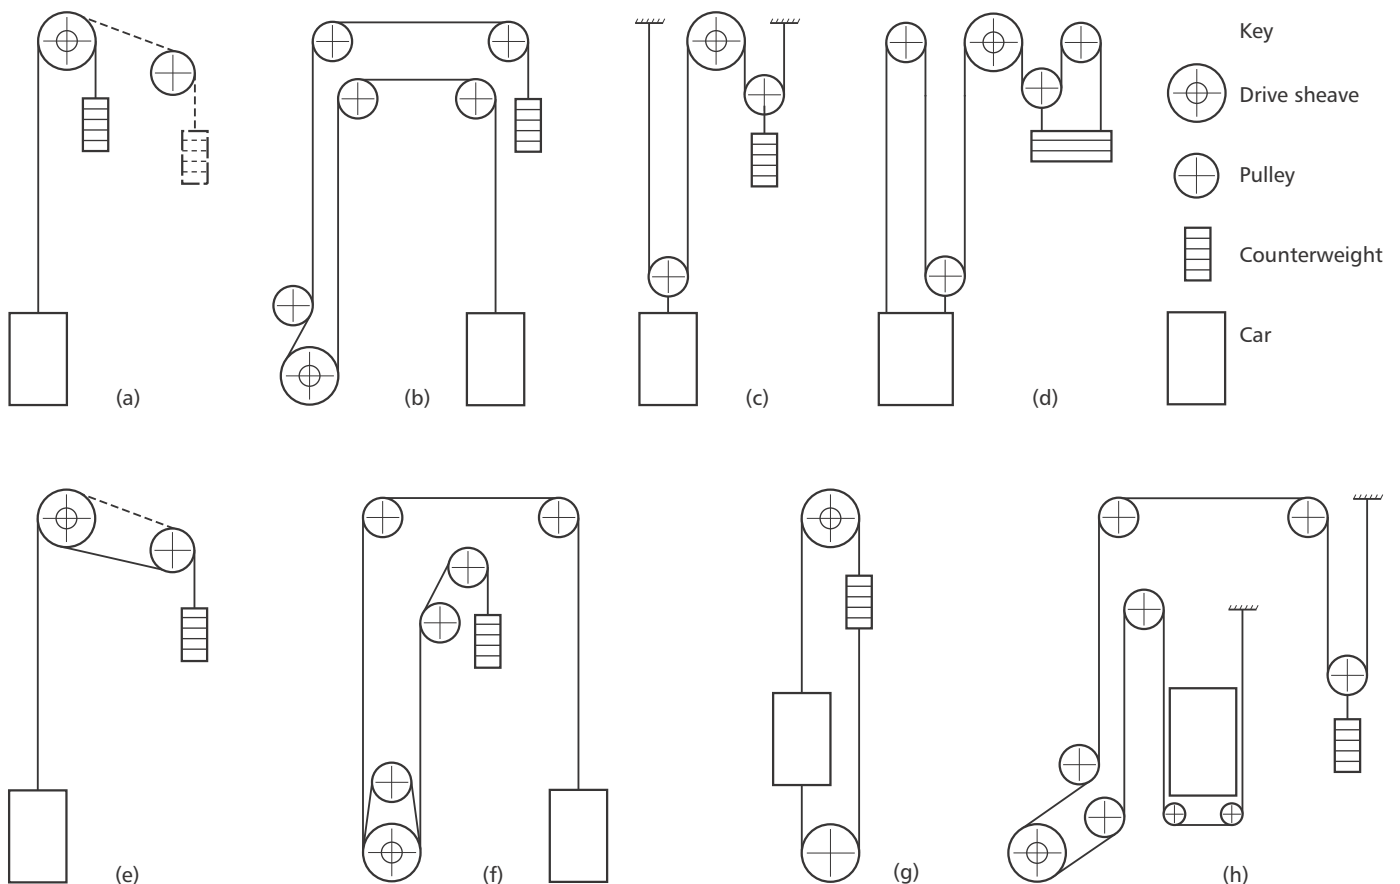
Roping systems; (a) 1:1 single wrap, machine above, (b) 1:1 single wrap, machine below, (c) 2:1 single wrap, machine above, (d) 3:1 single wrap, machine above, (e) 1:1 double wrap, machine above, (f) 1:1 double wrap, machine below, (g) 1:1 machine above with compensation, (h) 2:1 single wrap, machine below, underslung car
